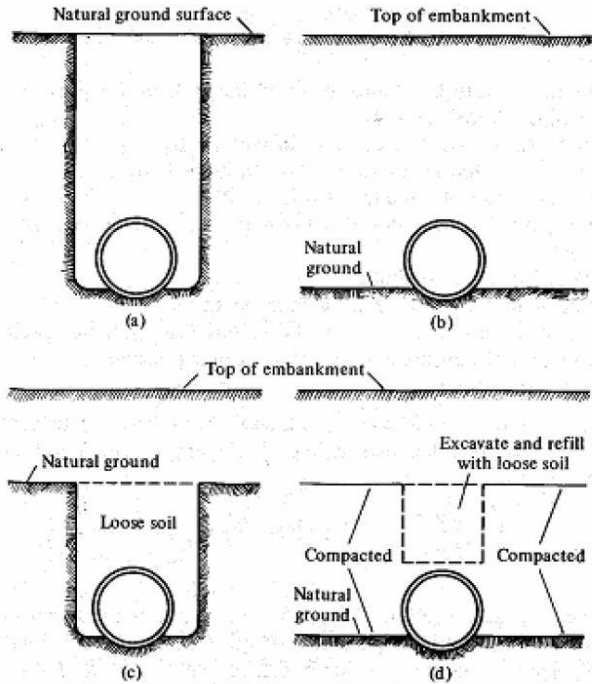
Various types of conduit installations (a) Trench installation, (b) Embankment installation (positive projecting), (c) Embankment installation (negative projecting), (d) Imperfect trench installation (Kang, 2007)
